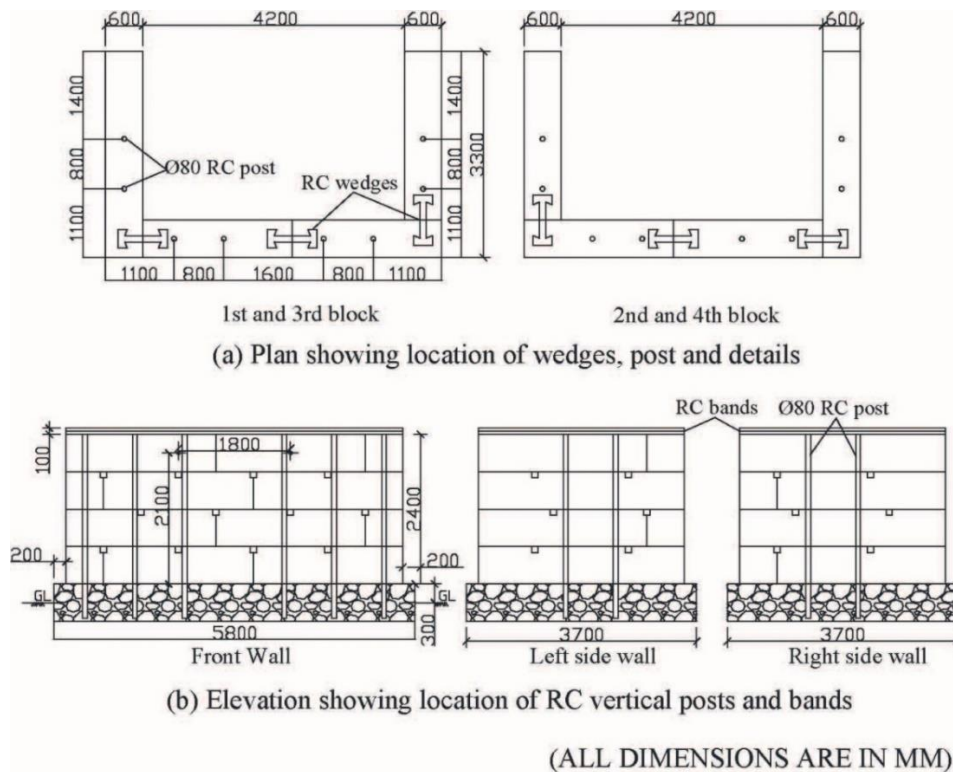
Details of reinforced rammed earth specimen (New-RE-B).
